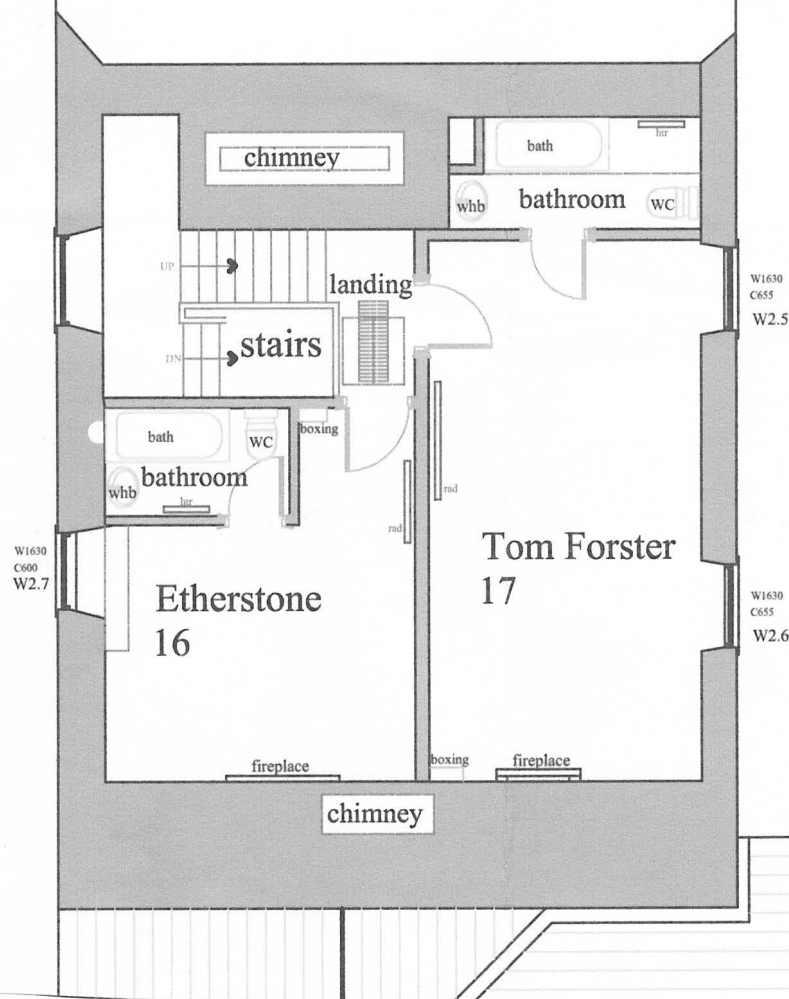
SECOND FLOOR SOUTHERN BUILDING
